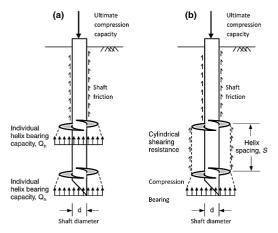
(a) Individual bearing method (b) Cylindrical bearing method [1].
